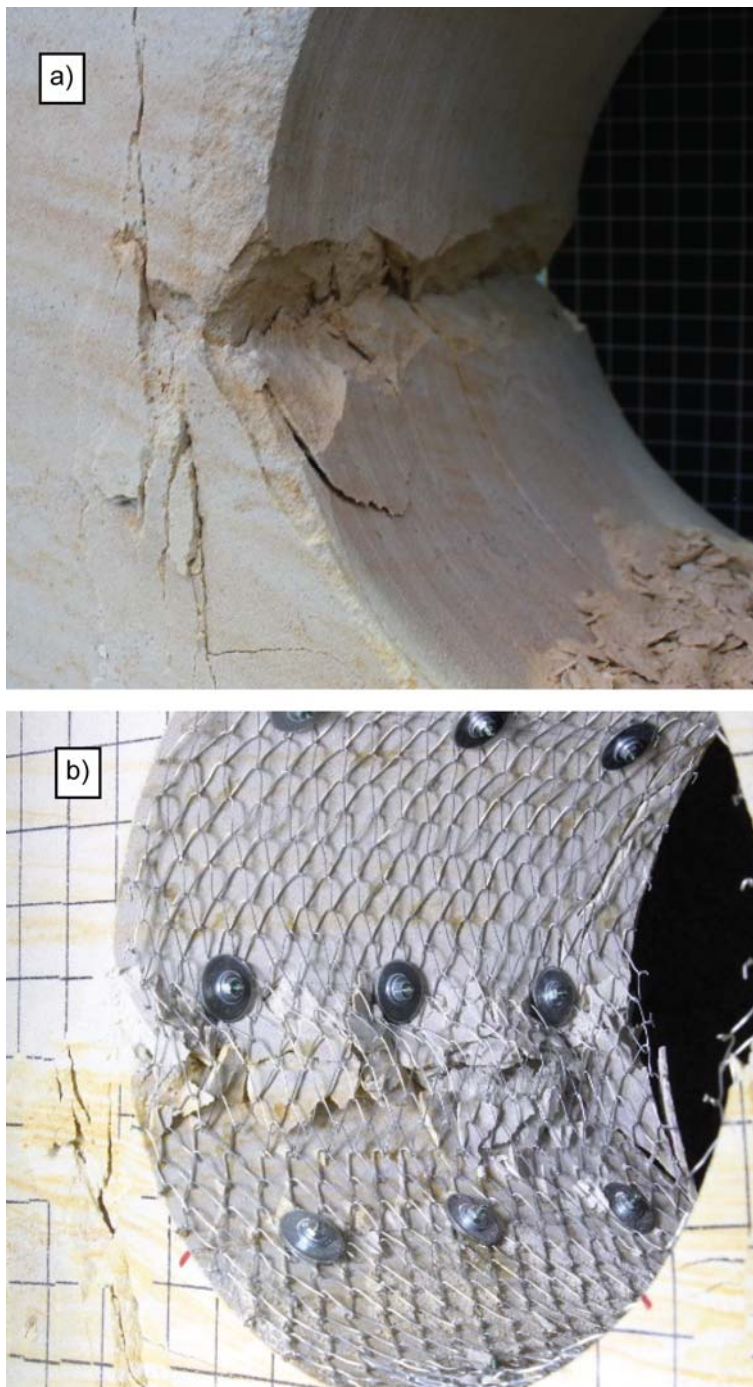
Sidewall after failure a) unsupported tunnel b) chain link mesh and rock bolt (square pattern) support (Specimen No.9).
